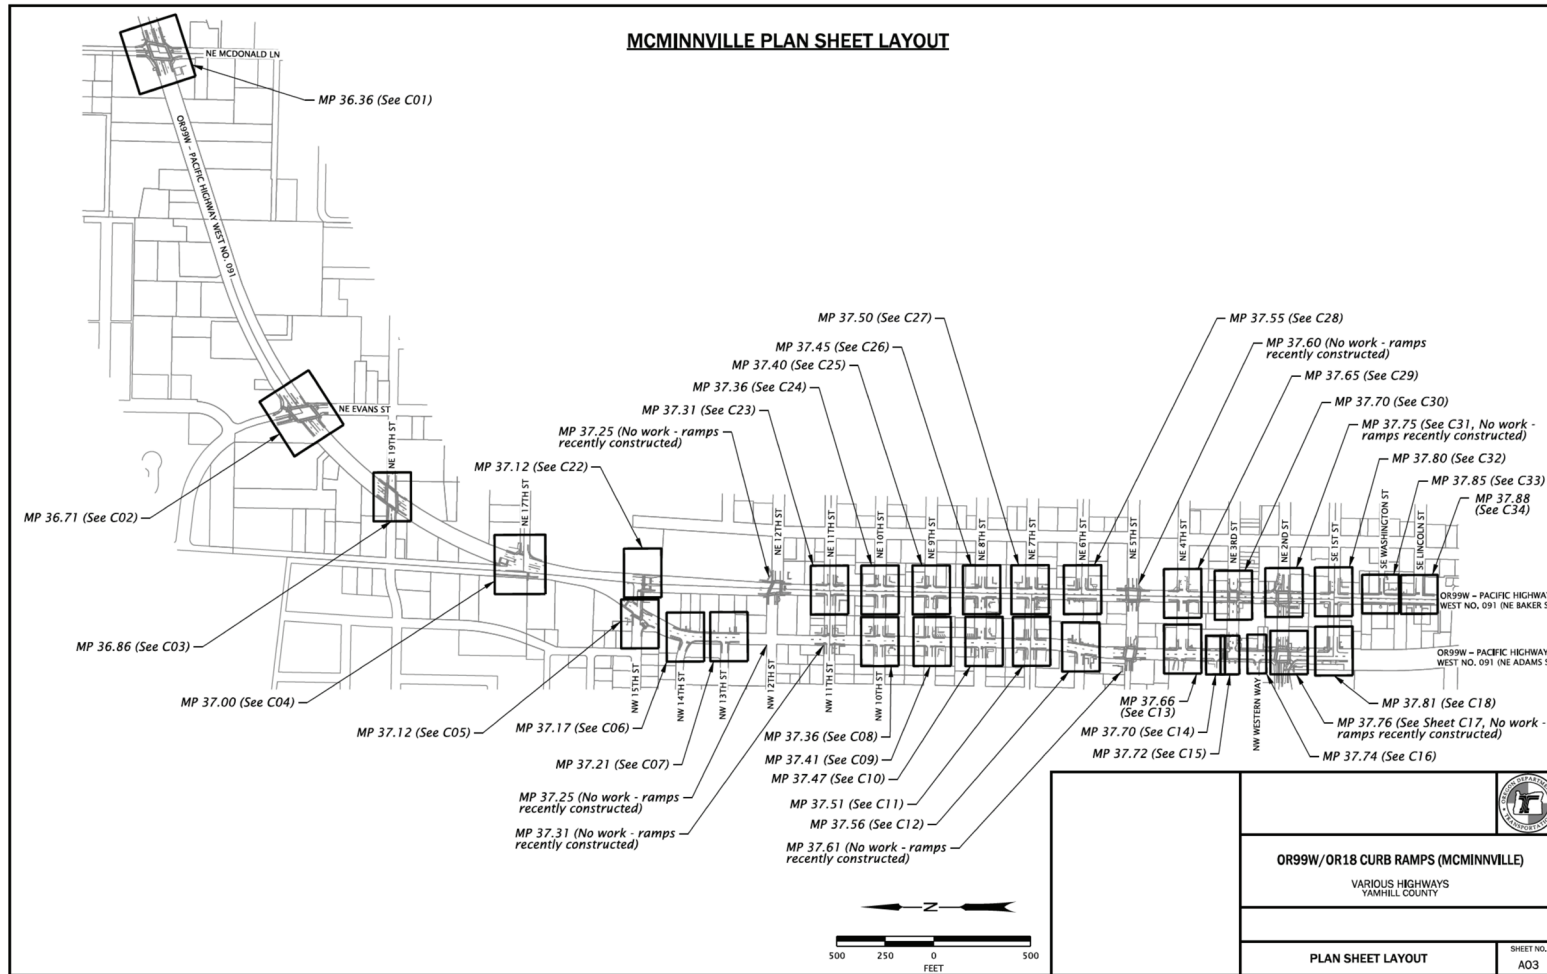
Example Curb Ramp Plan Sheet Layout – Milepoint
